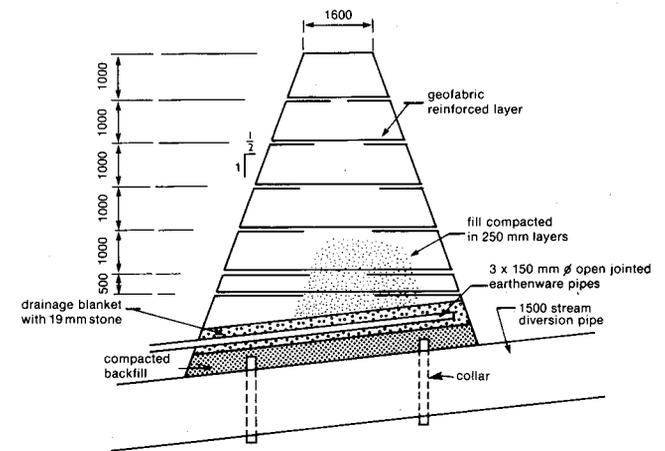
Section through geofabric-reinforced gravity-section filter dam
